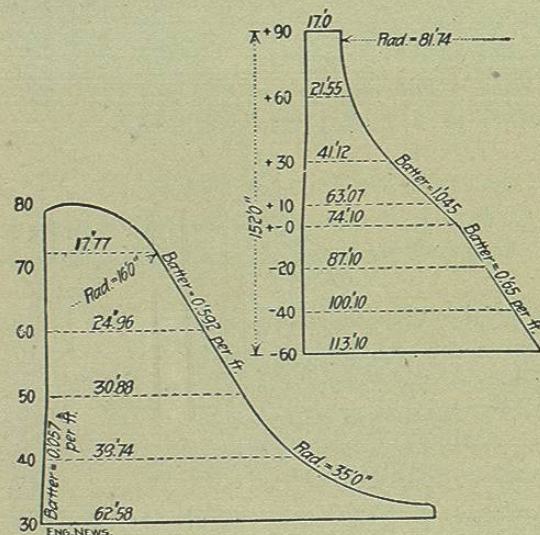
SPIER FALLS DAM, N. Y. PROFILES OF OVERFALL AND ABUTMENT SECTIONS.
